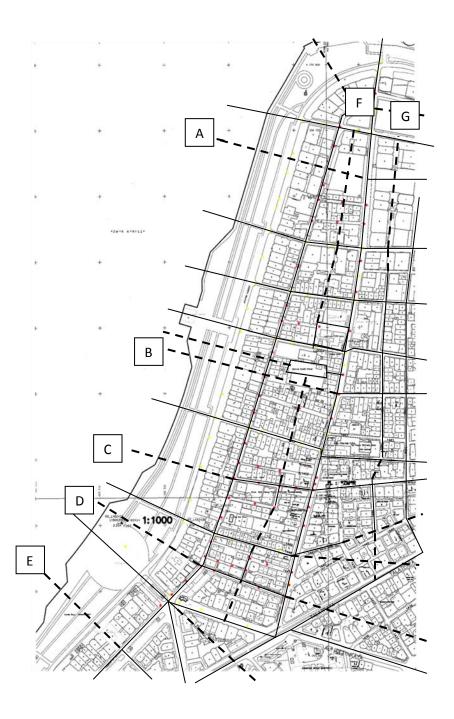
The Alsancak Site with the existing (\_\_\_\_) and the potential air paths (\_ \_ \_) on the planimetric (2D) level.
